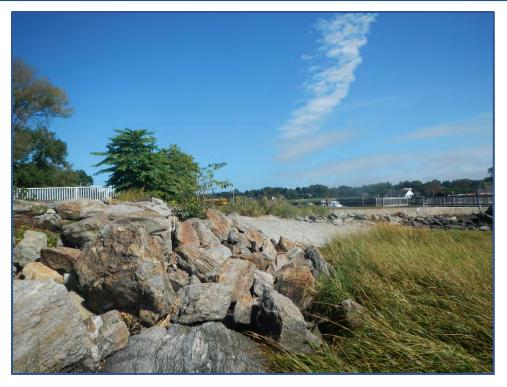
Existing Beach and Stone Revetment Along Seawall
